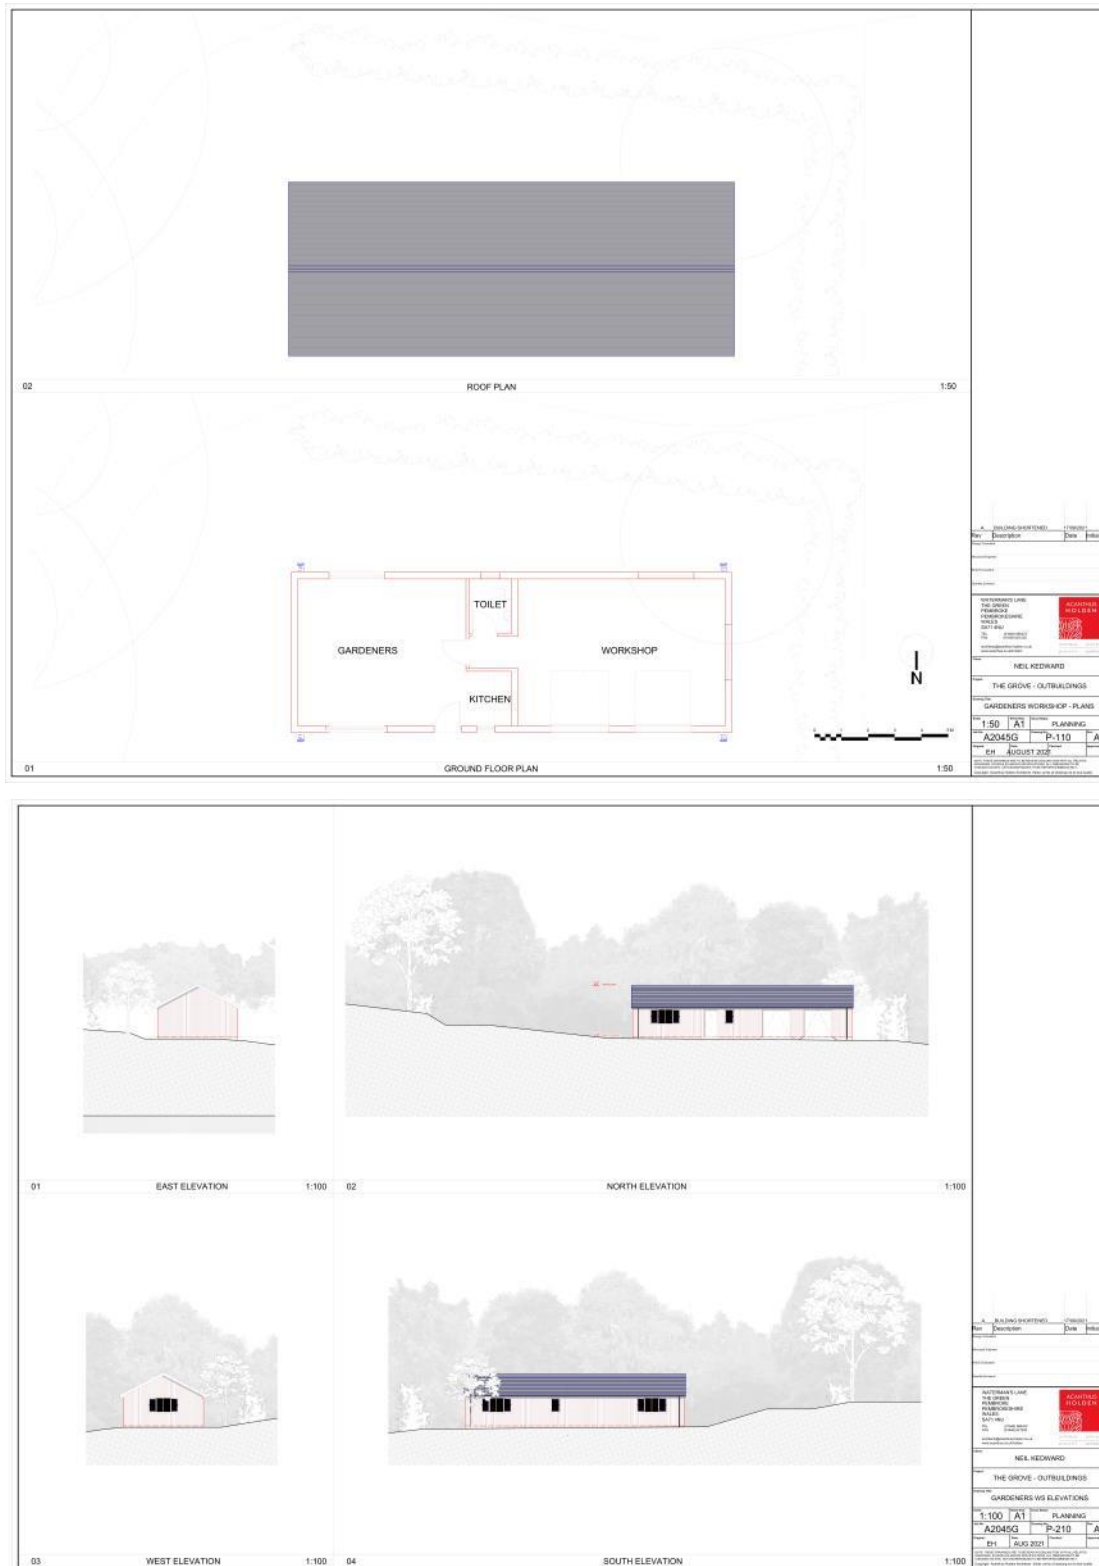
Plans and elevations of the proposed gardeners workshop. Plans provided by the client as part of the planning application (21/0617/PA), not reproduced to scale.
